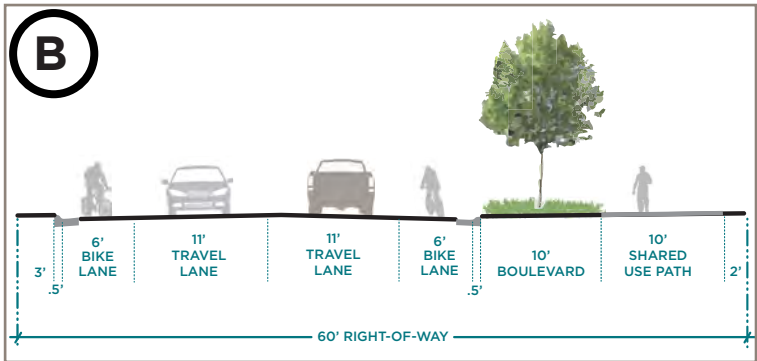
Preferred Alternative East Broadway Segment 'B' Typical Section Looking East
